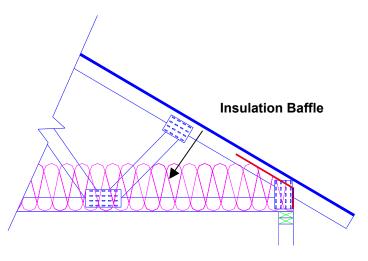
A baffle attached to the top plate at the roof perimeter prevents insulation from entering into the soffit. It should be used between every roof truss if blown insulation is used in the attic.
